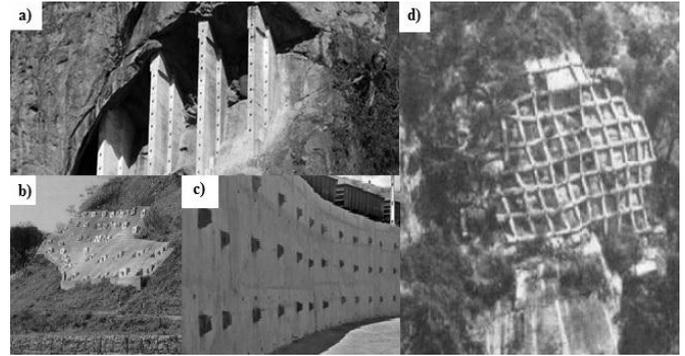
Retaining structures using anchor a) Buttress anchored to stabilize the Cantagalo-RJ, b) Anchored plate for slope stabilization, c) Ground anchor wall, d) Anchored grill, Agulha do Inhangá-Copacabana, Rio de Janeiro. [17]
